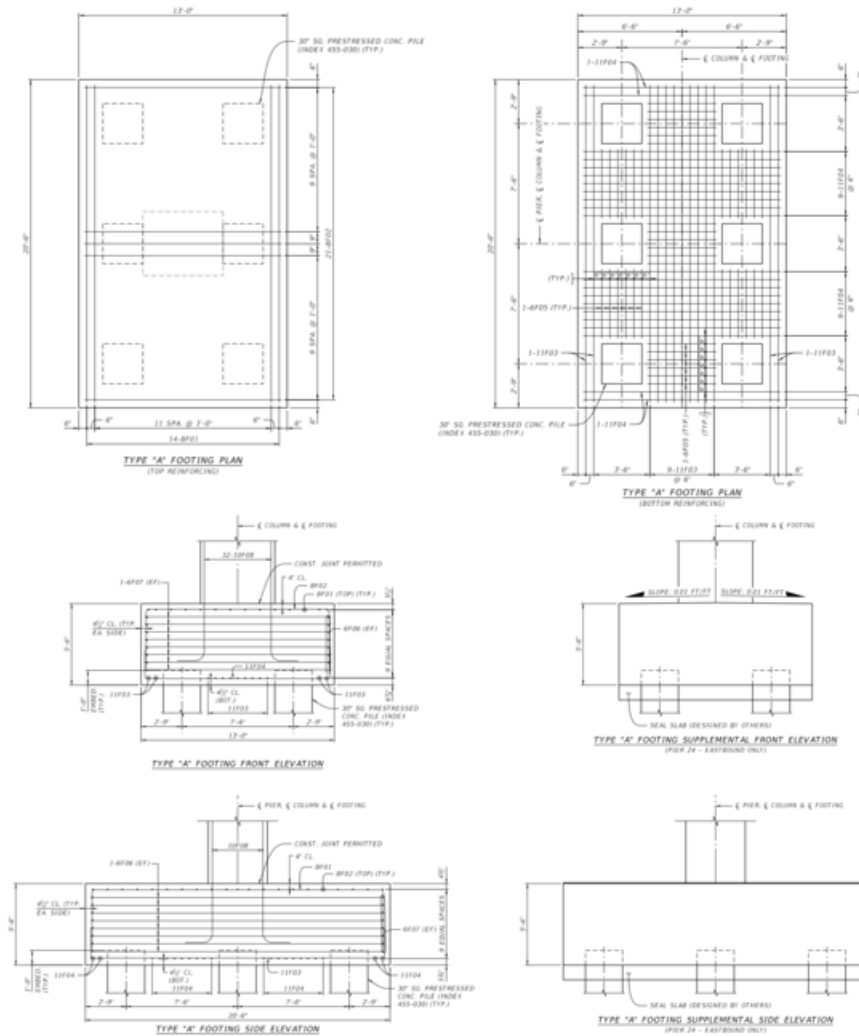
Carbon-steel reinforcement layout – Pile cap 6-pile group “B” of the selected Pier n.24 of the Eastbound Bridge (B1-113, B1-114)
